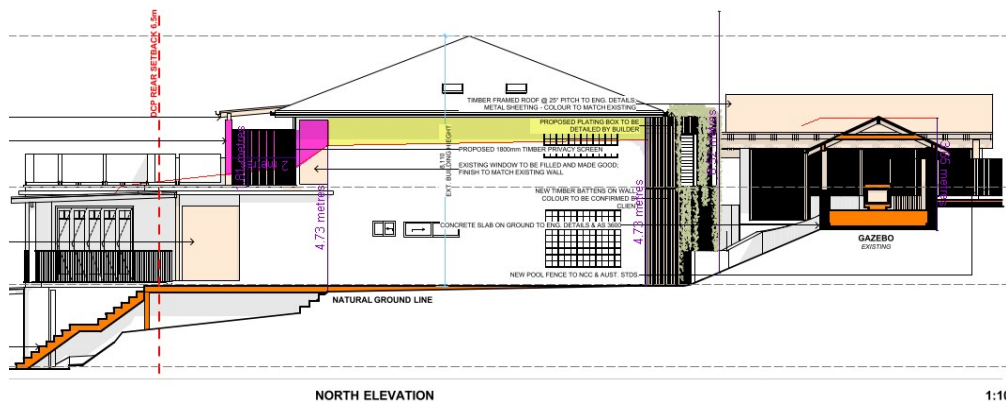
Northern elevation envelope breach indicated in pink (yellow indicates existing breach).
